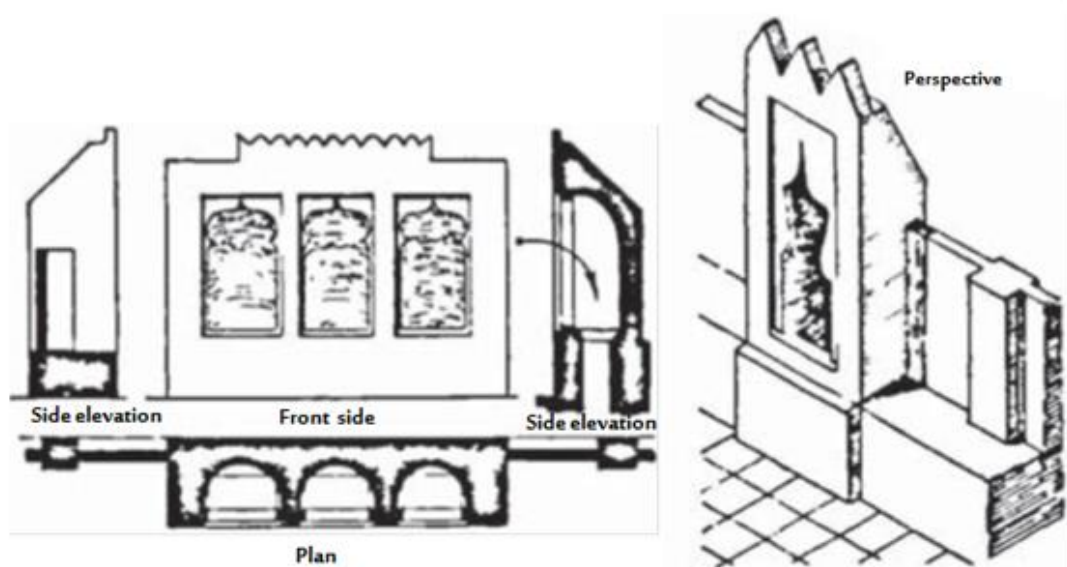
'Badgir'; perspective, plan, section and front and side elevation in Baghdad (Al-Azzawi, 1984)
